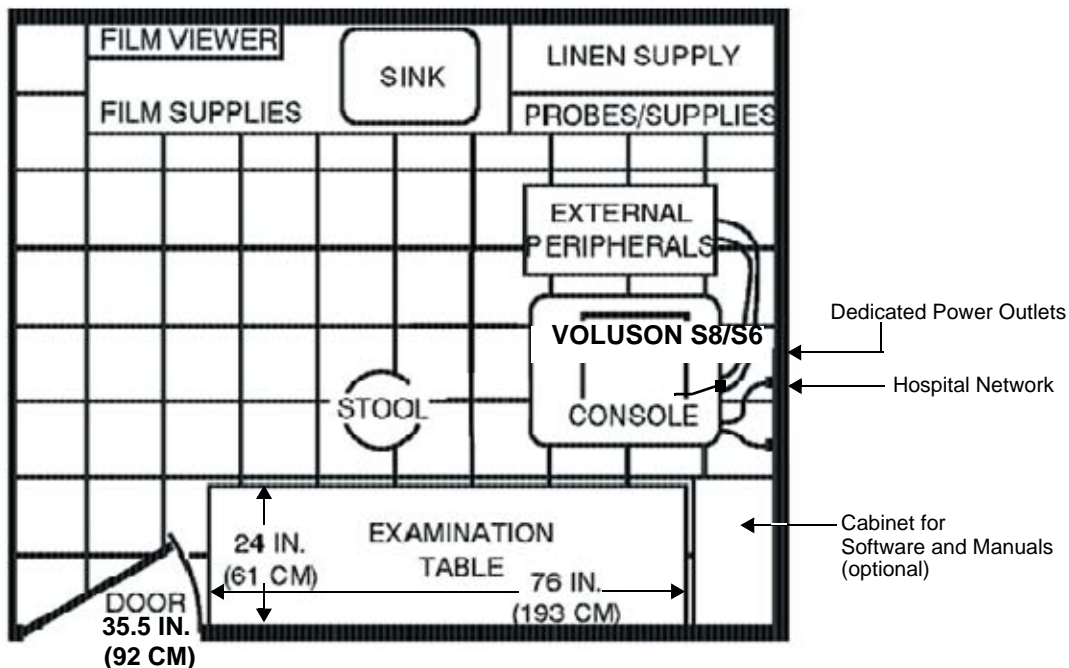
Recommended Floor Plan 4.3m x 5.2m (14ft x 17ft)
